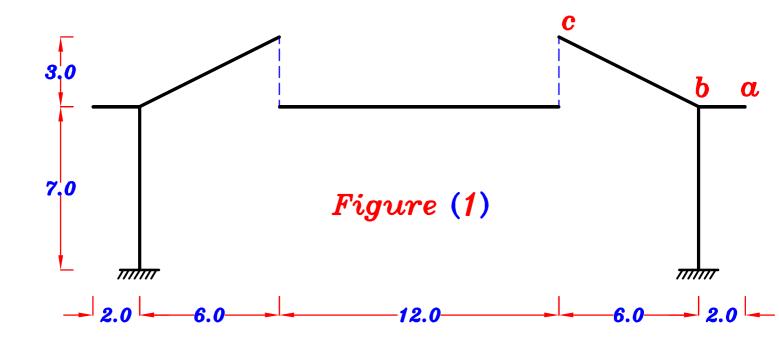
shows a sectional elevation For an Industrial building of overall plan dimensions $28.0 \text{ m} \times 42.0 \text{ m}$, with 24.0 m clear span without any intermediate columns. The covering system consists of set of horizontal and inclined slabs where shown in the Figure. The level of horizontal slabs is 7.0 m From ground level. Only two sets of windows are allowed where shown in the Figure.
